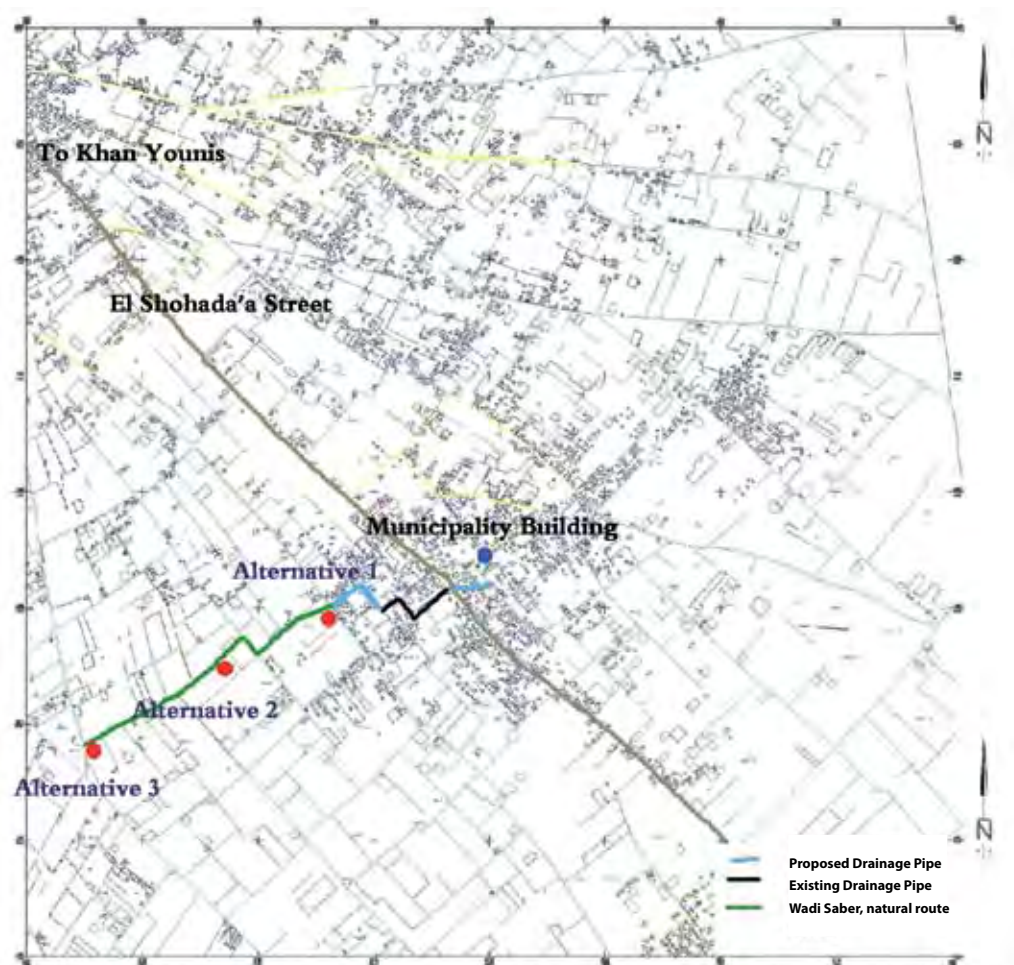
Proposed alternatives, route of the wadi, existing and proposed drainage pipe.
